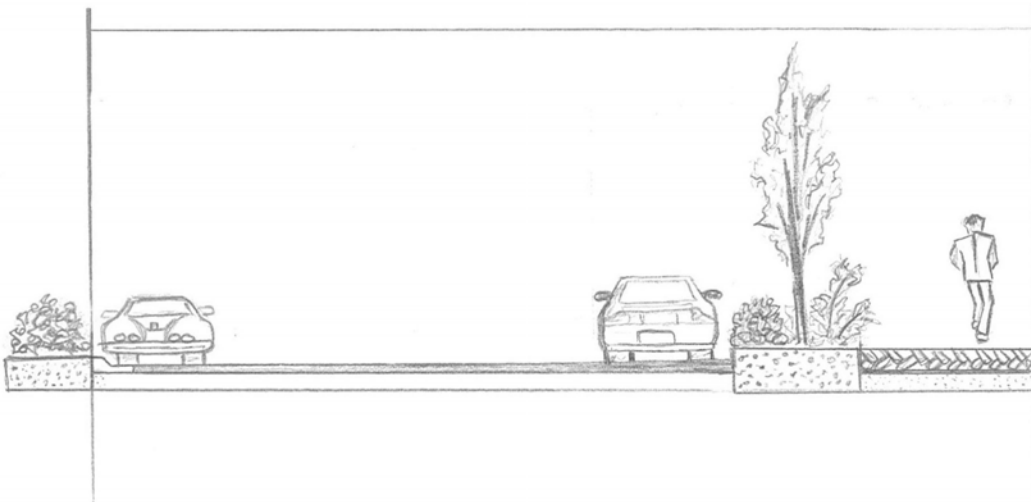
Example of a Trail Adjacent to a Roadway (e.g. Possible Park Ave Greenway)
